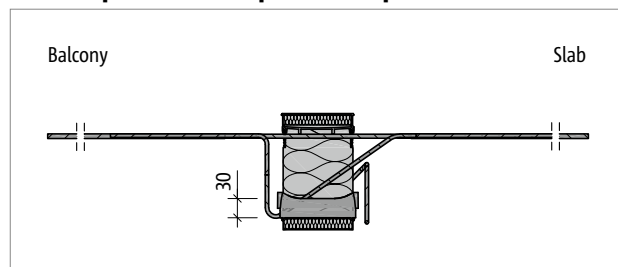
Schöck Isokorb® XT type K-M7 to M10: Product section
